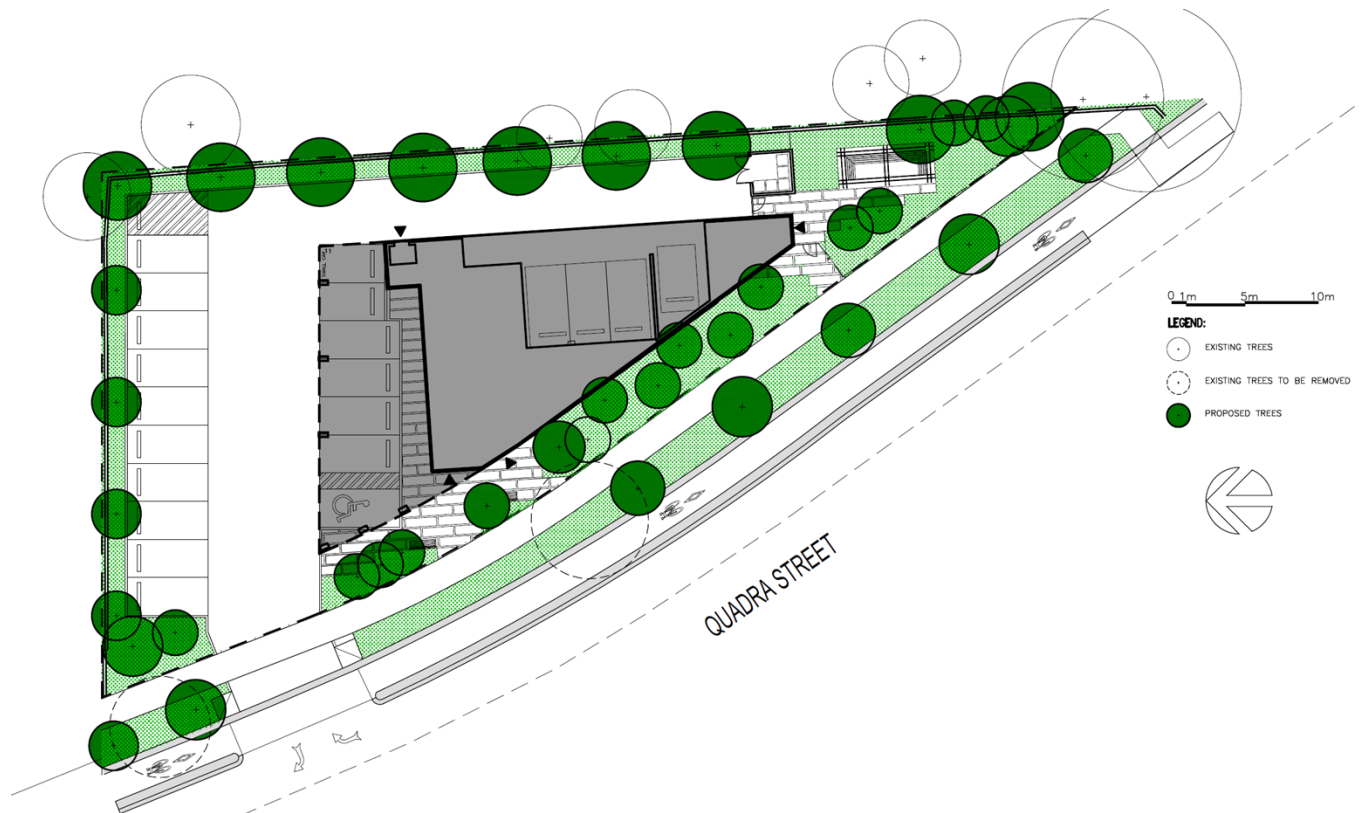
Site Plan - from Plans by O.C.A. Architecture Inc.
